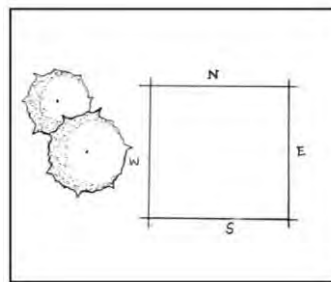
Plantation and shedding: plan shows Tall tree in the west.
